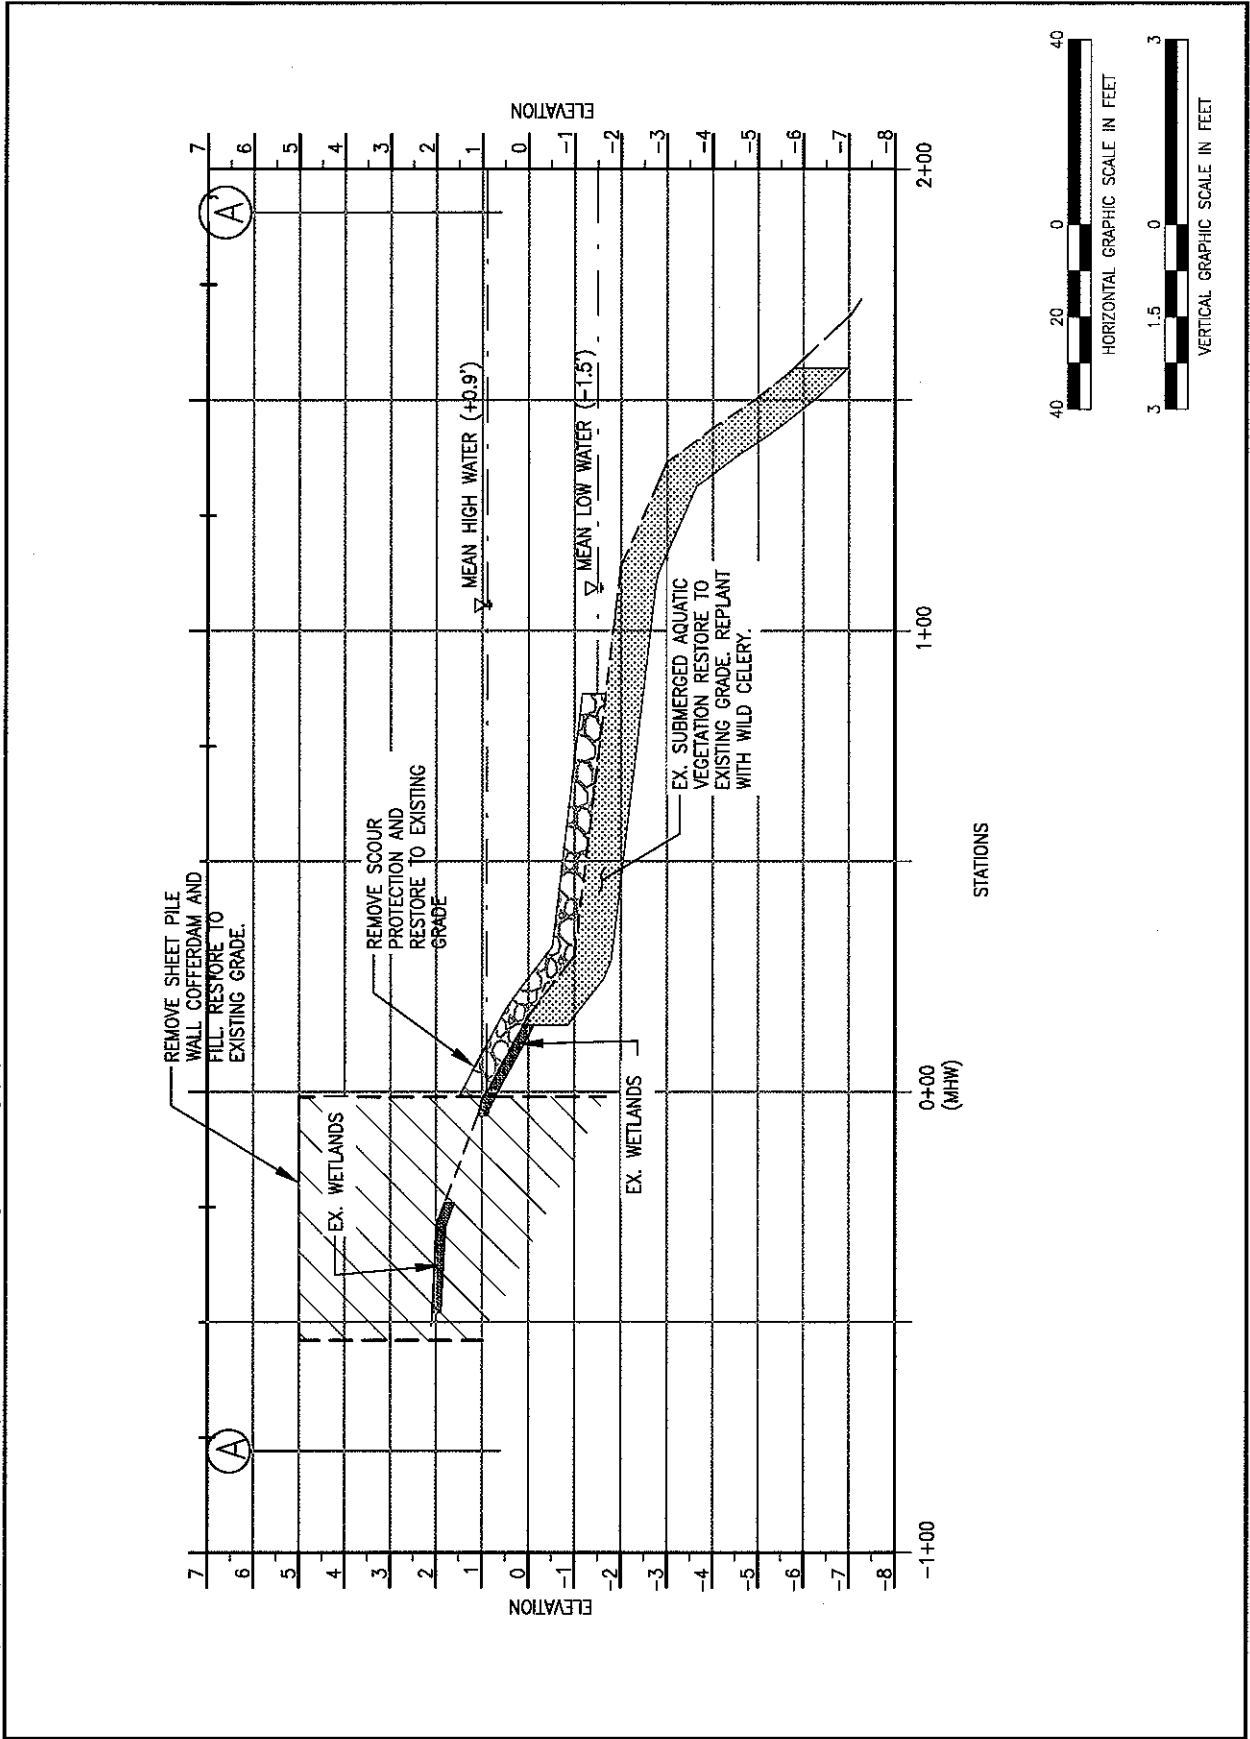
SUBMERGED AQUATIC VEGETATION (SAV) RESTORATION PLAN, LARGE COMPONENT TRANSPORT ROUTE ROLL-OFF FACILITY CROSS SECTION A - A'
